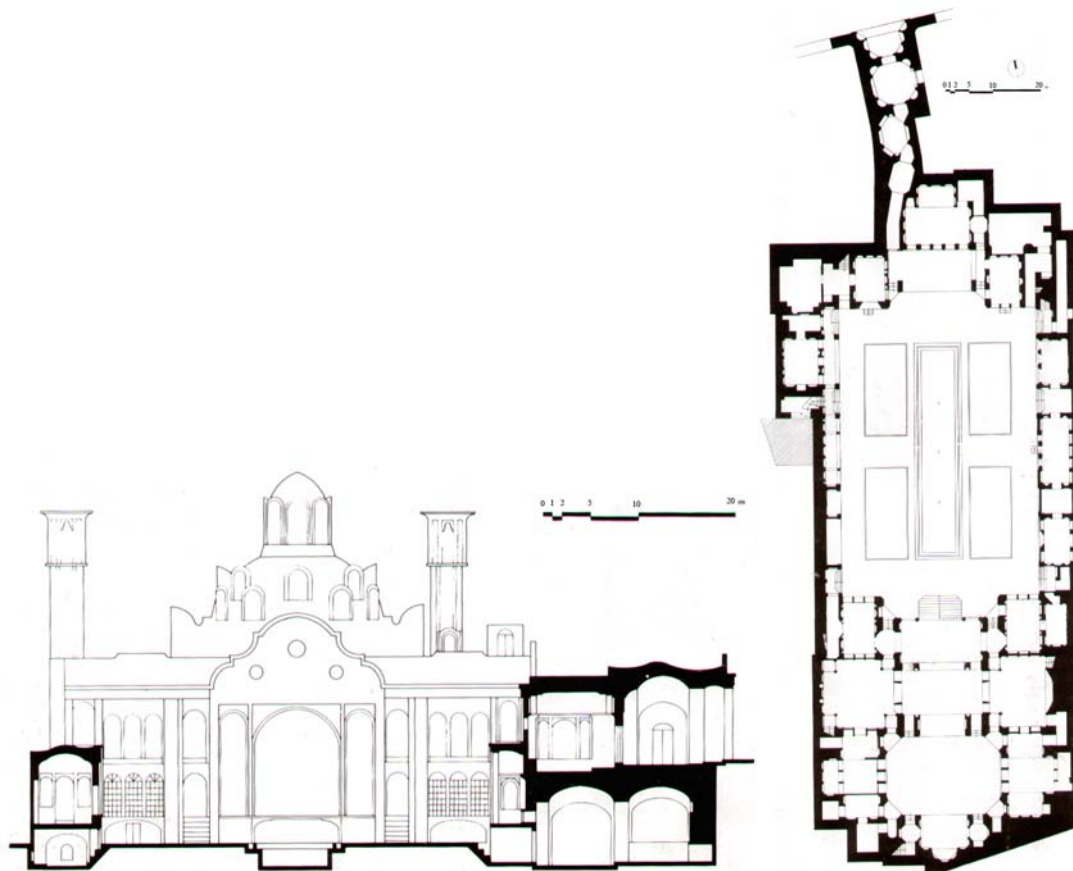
, 8: Section and Plan of Boroojerdi- ha House
